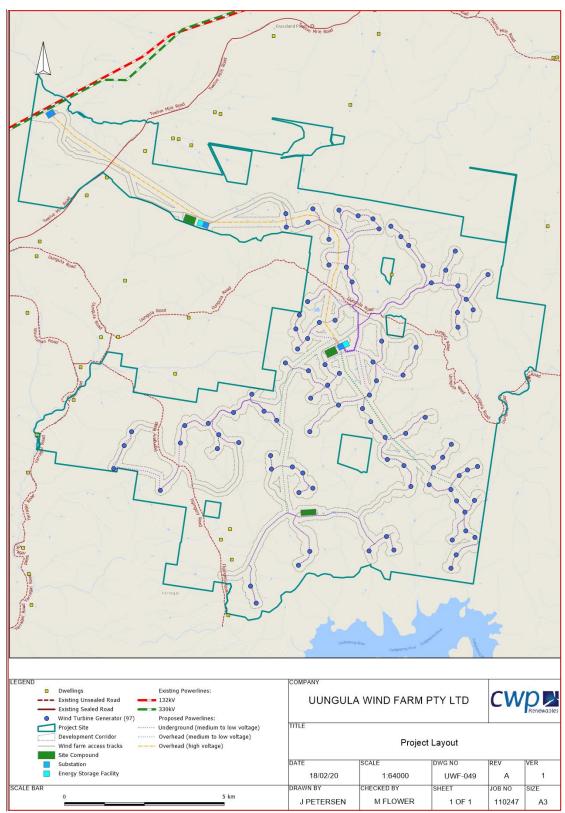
Uungula Wind Farm Site Layout and Surrounds
